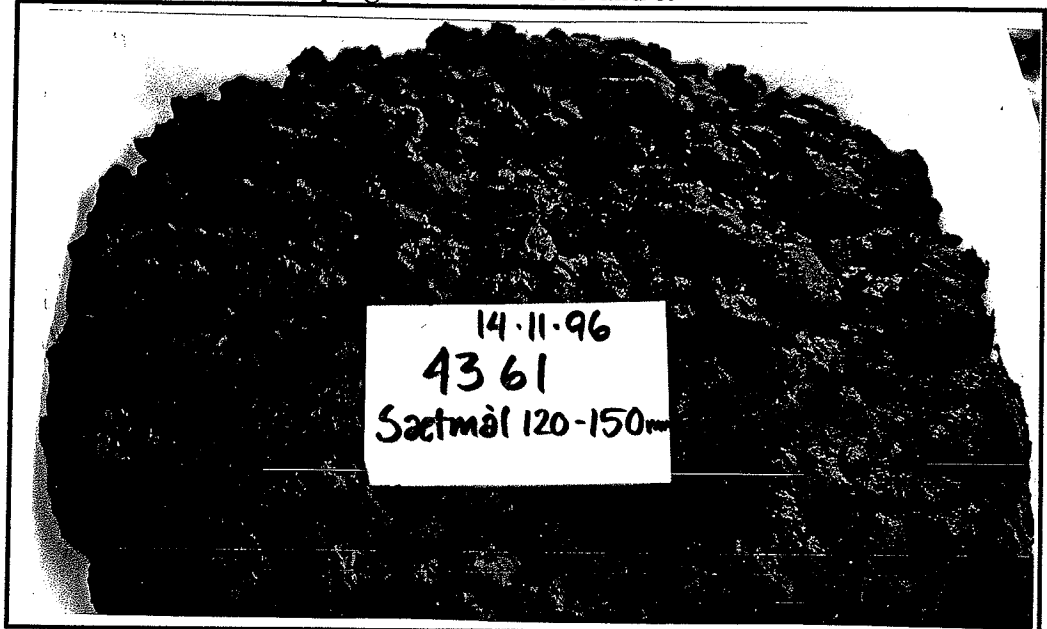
Concrete type applied at test No. 7. (F5, negative No. 25).
